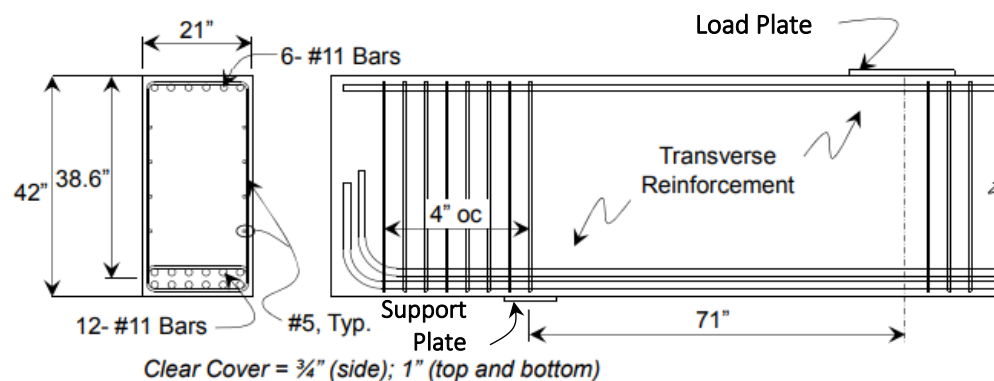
Control specimen from Project 0-5253 (figure from Report No. 0-5253-1)
